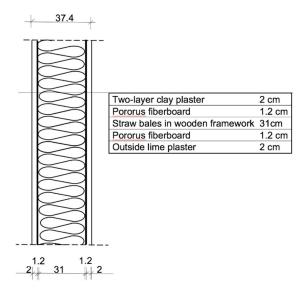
Cross-section of the wall made using the straw-bale technology. Source: own study.
